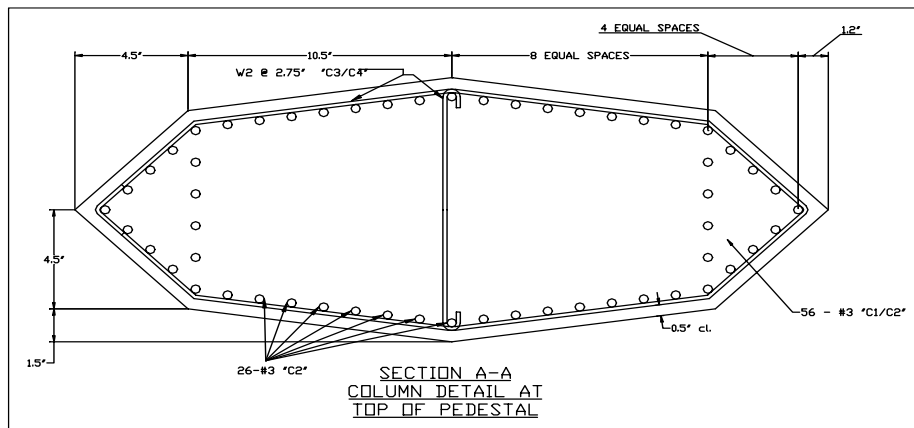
Typical column cross section in single-column piers (1 in. =25.4 mm)
